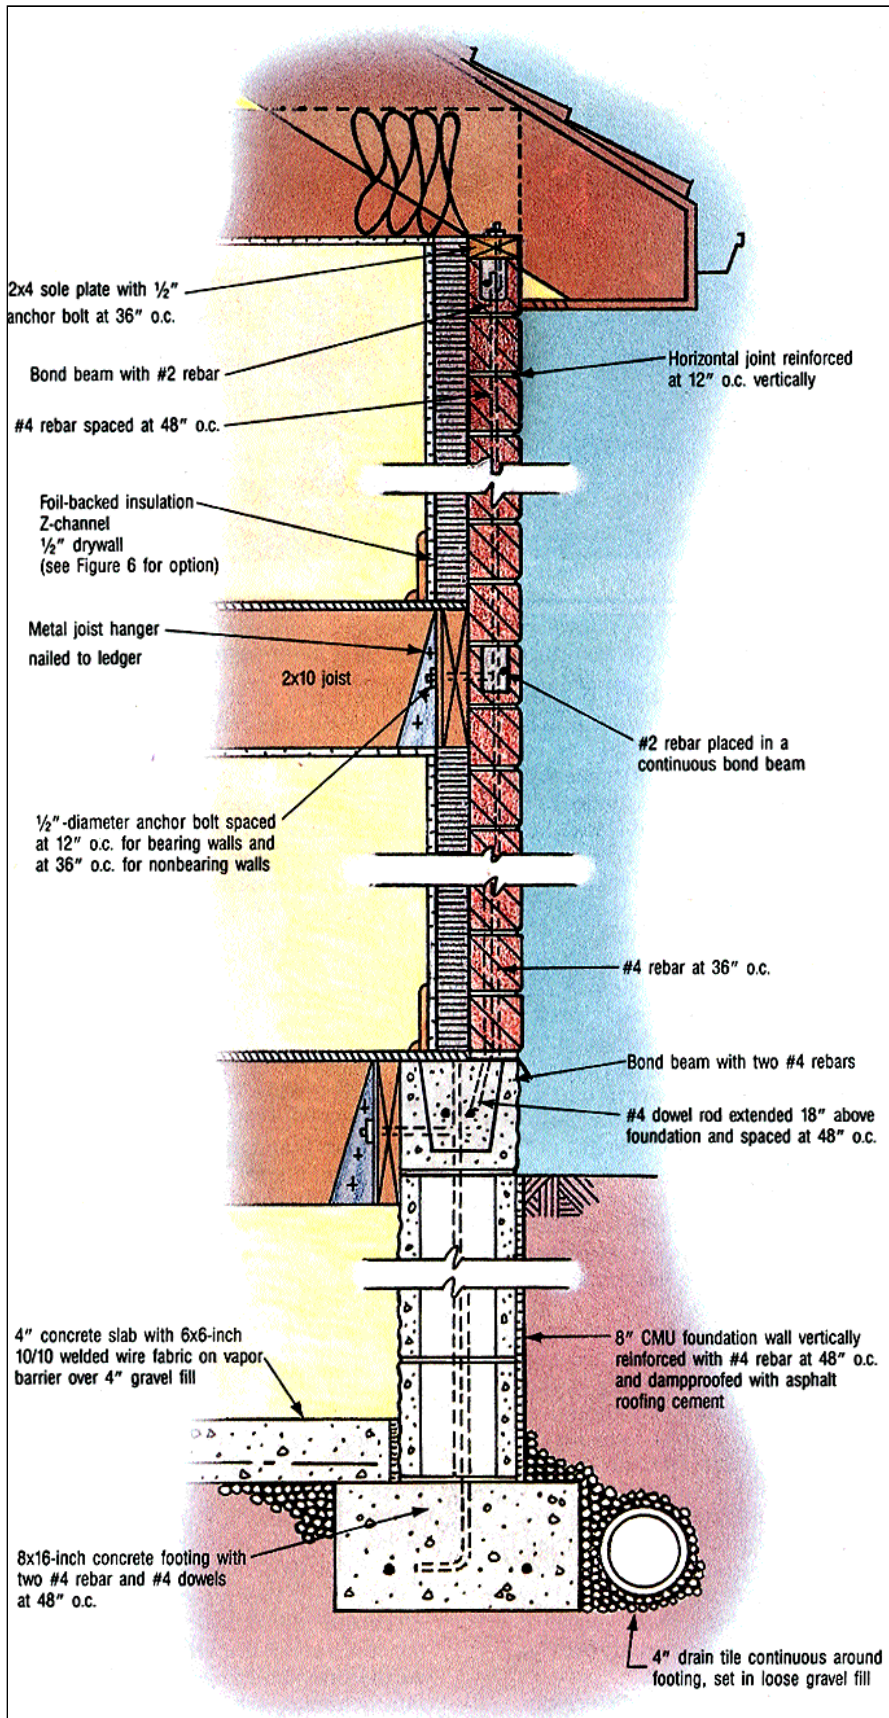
A typical section of the single-wythe, reinforced brick wall.
